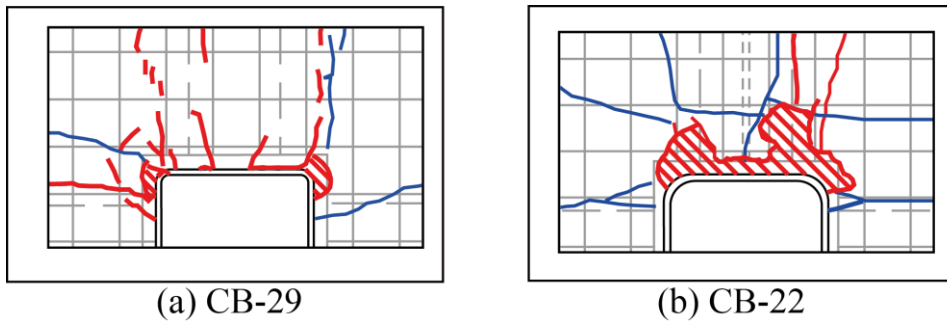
Final condition of concrete crush adjacent to the of RHS column face
